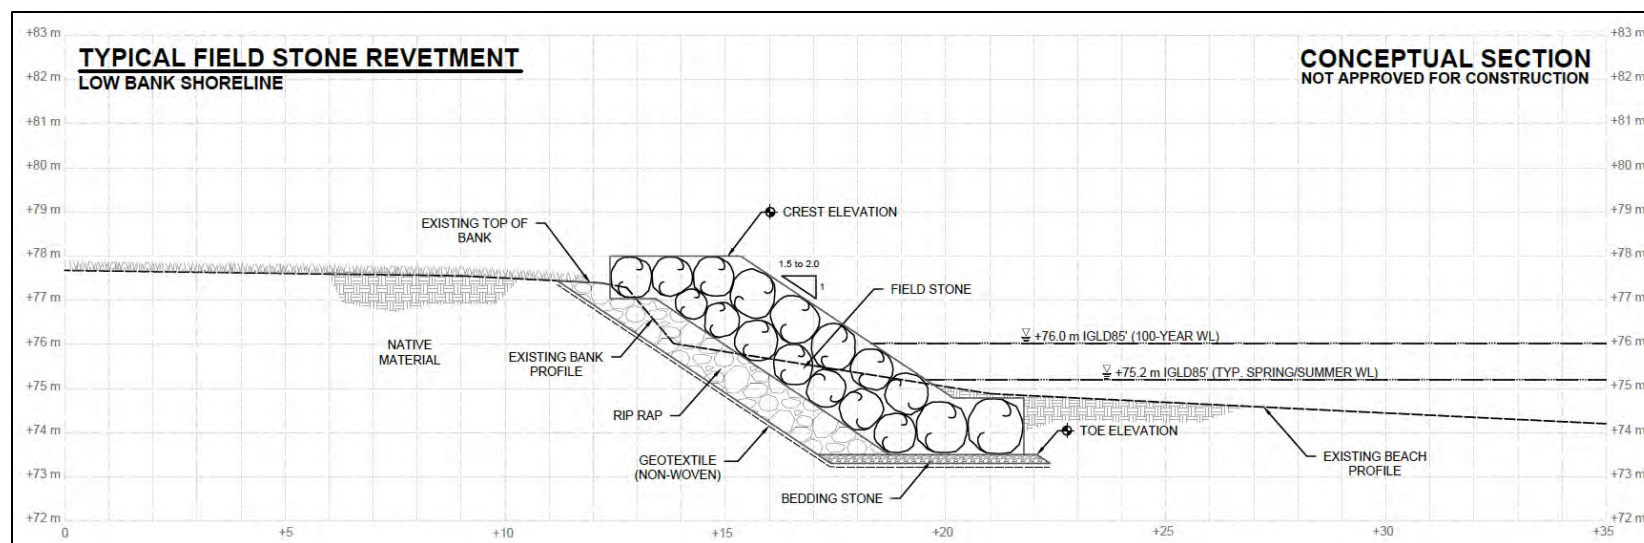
Recommended Typical Field Stone Revetment Concept for a Low Bank (<3 m)
